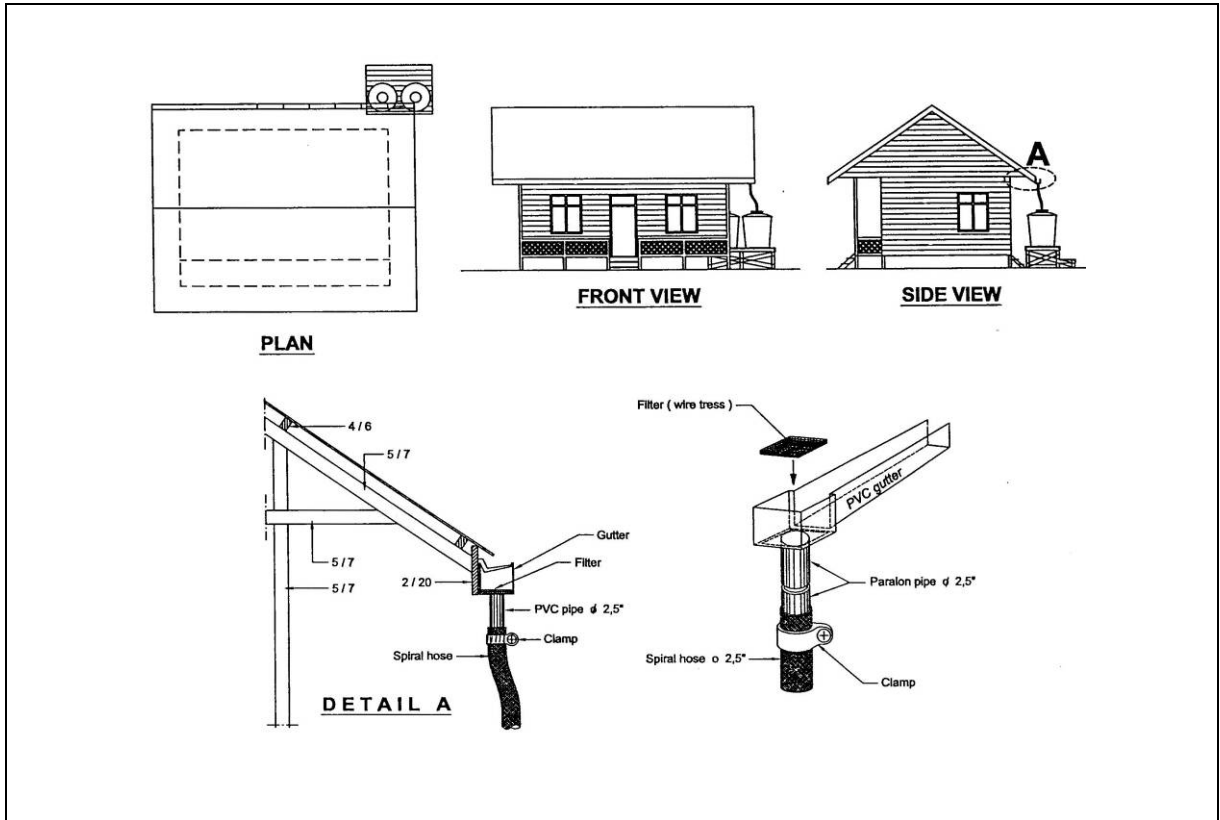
Rainfall collection from roof catchment, gutter installation
